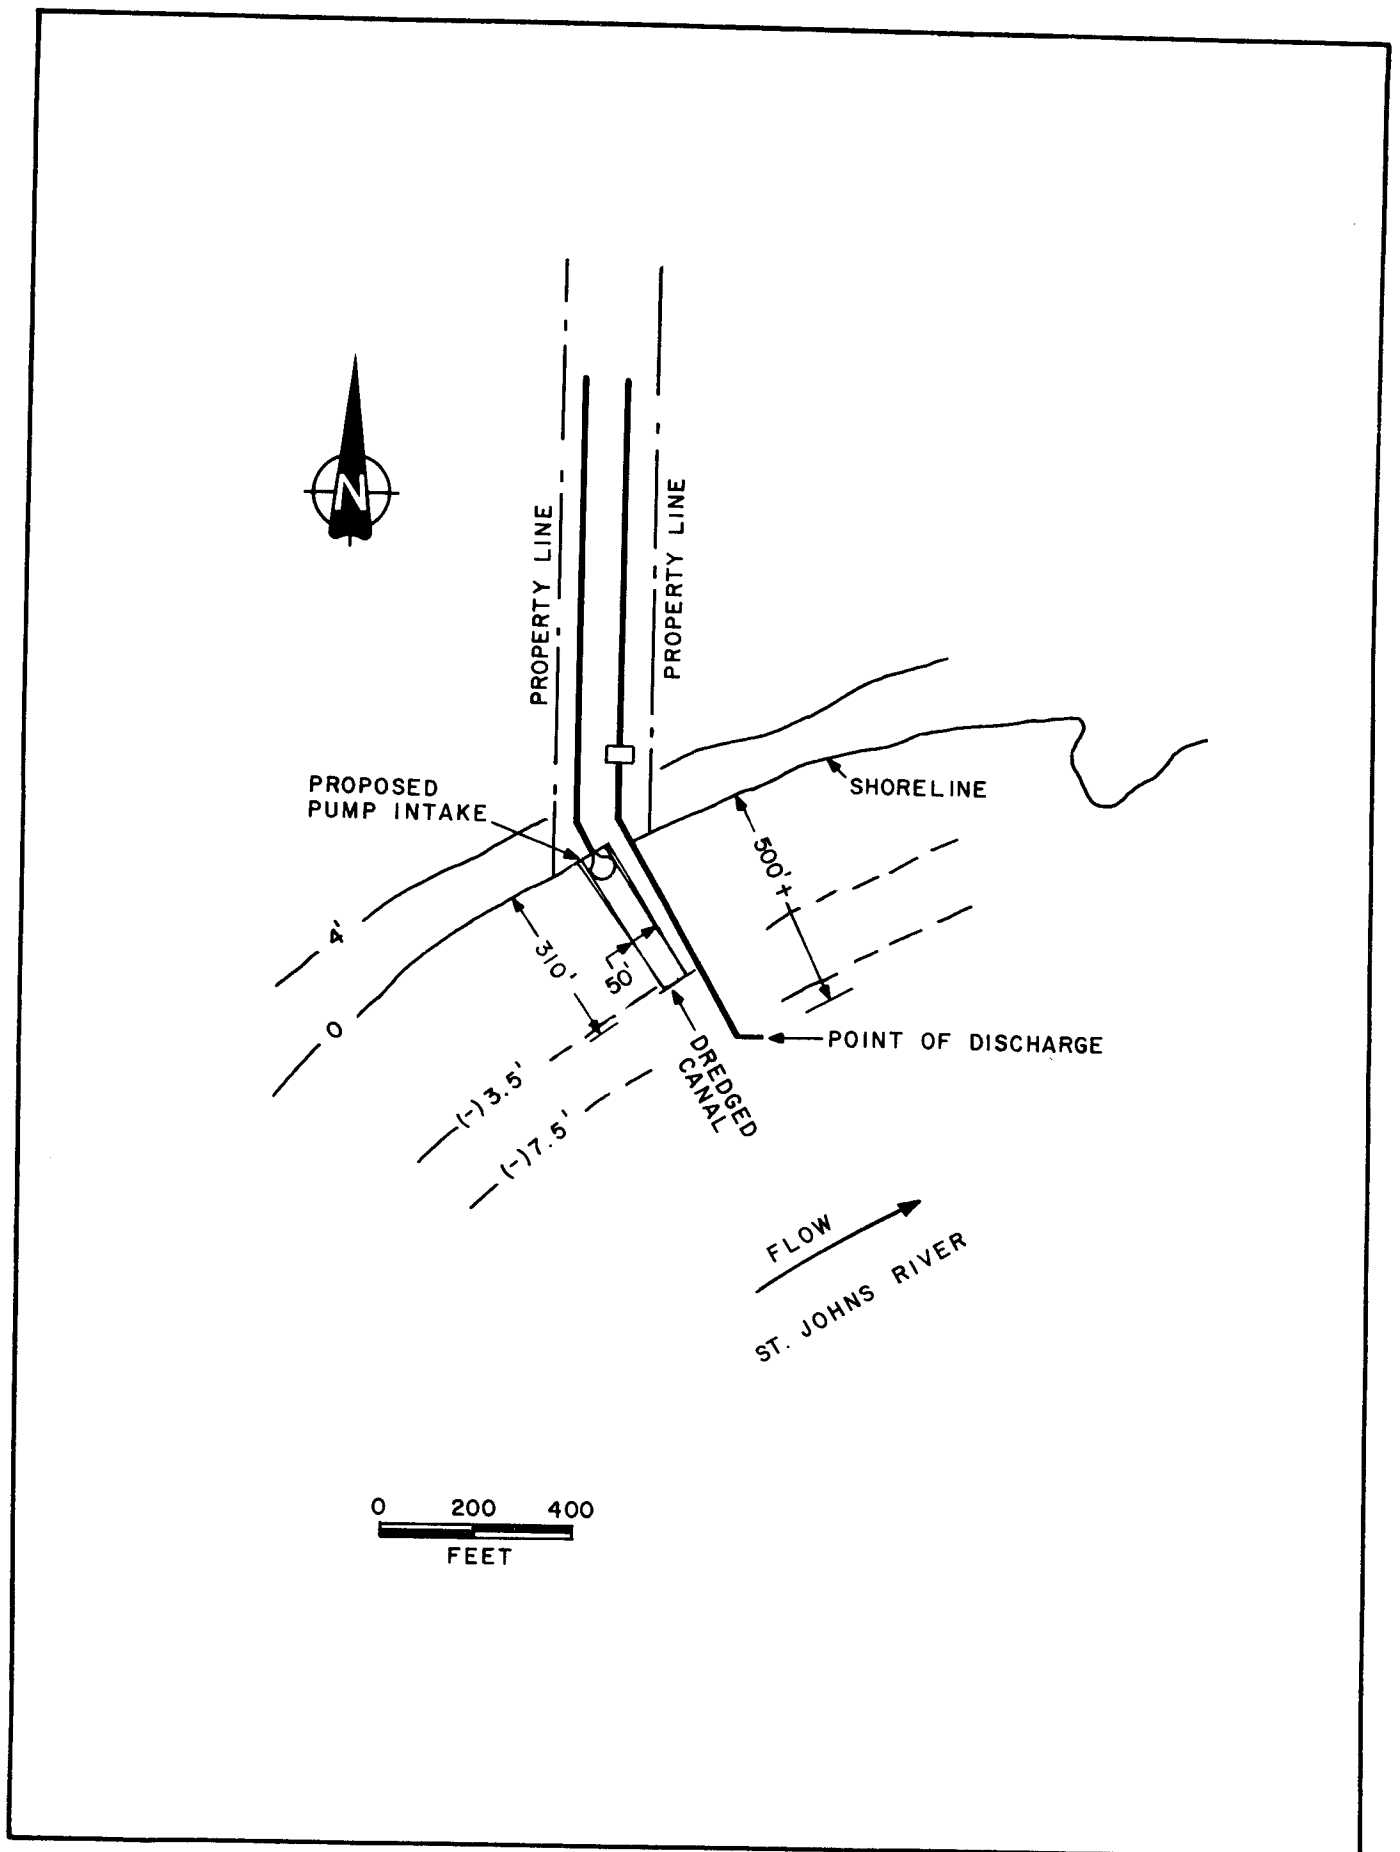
Intake and Discharge Structures Dredge Plan.
